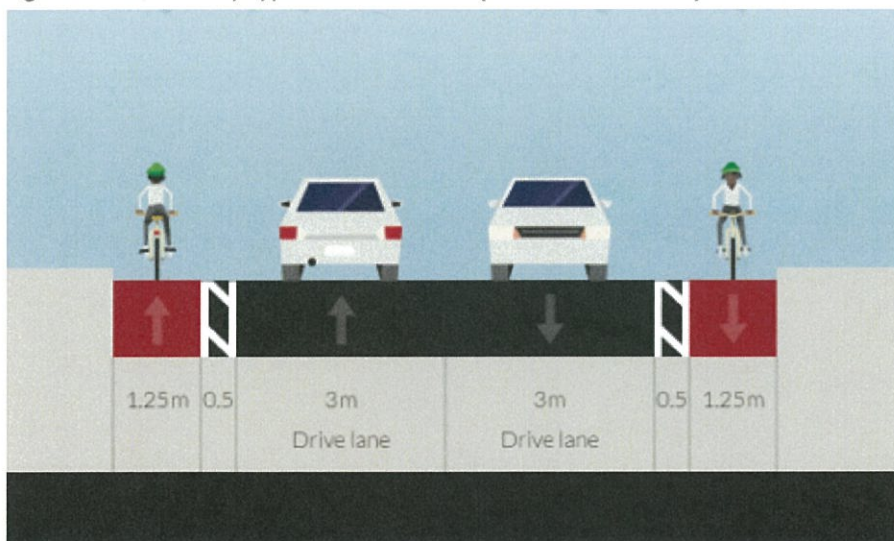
to Figure 3.4 indicate treatments proposed for this section of Broadway.
